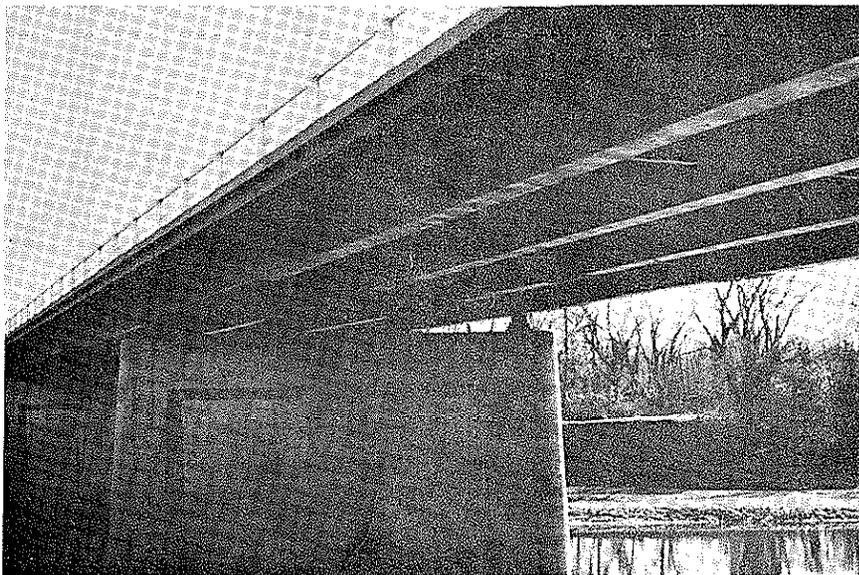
Photograph of approach span and portion of main span (looking south).
